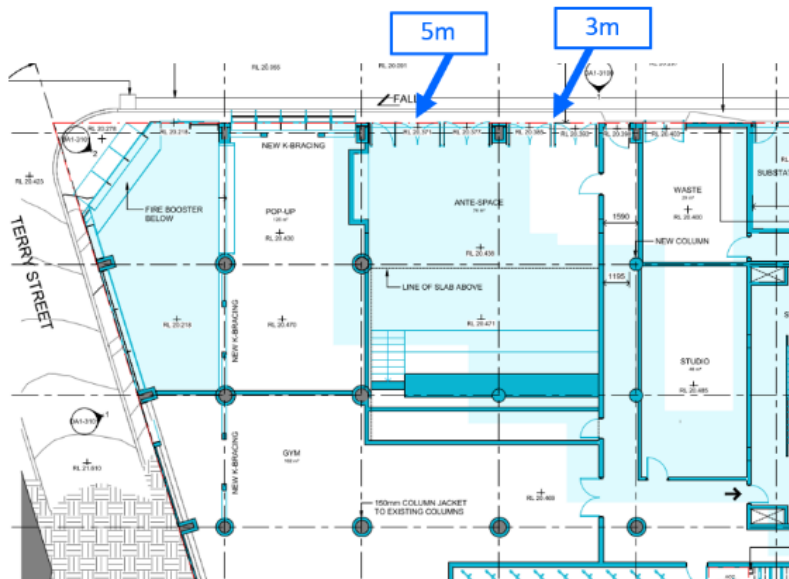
original plans lodged with the application show the Town Hall ante-space was to be provided with full width doors opening onto Sophia Street with a combined width of 8m.
